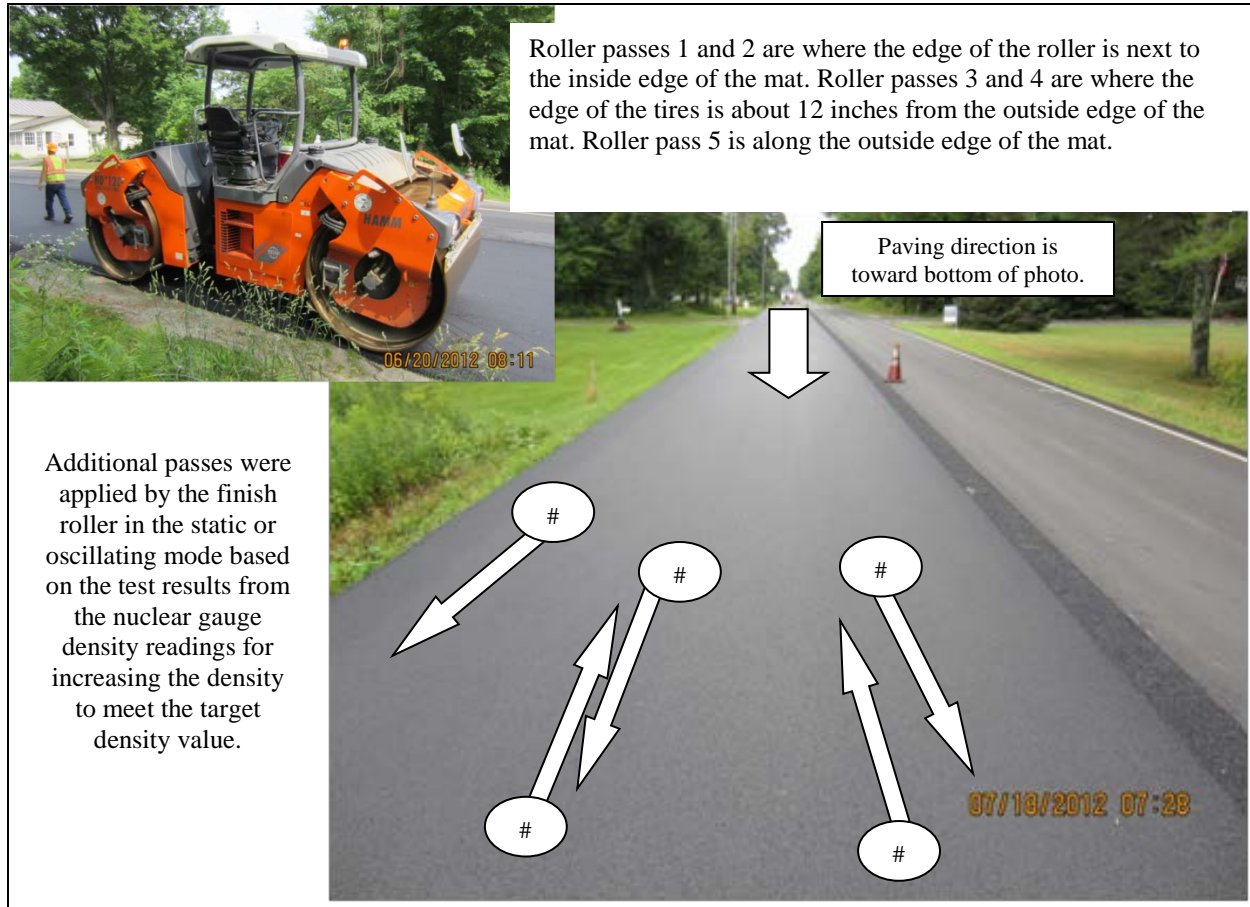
HAMM oscillatory double steel drum roller and pattern used for finish rolling of the WMA and HMA mixtures.
